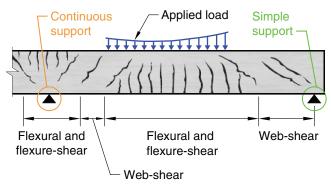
Types of cracking in concrete beams.
